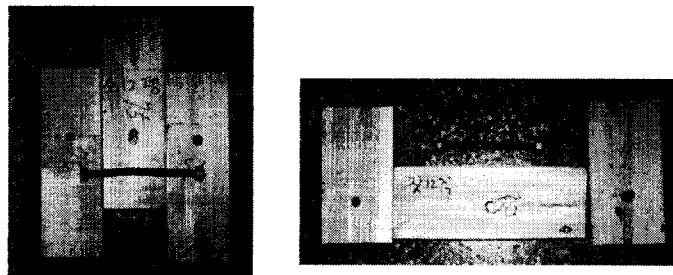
Failure modes for double shear bolted connections with softwoods and 12.4mm bolts
